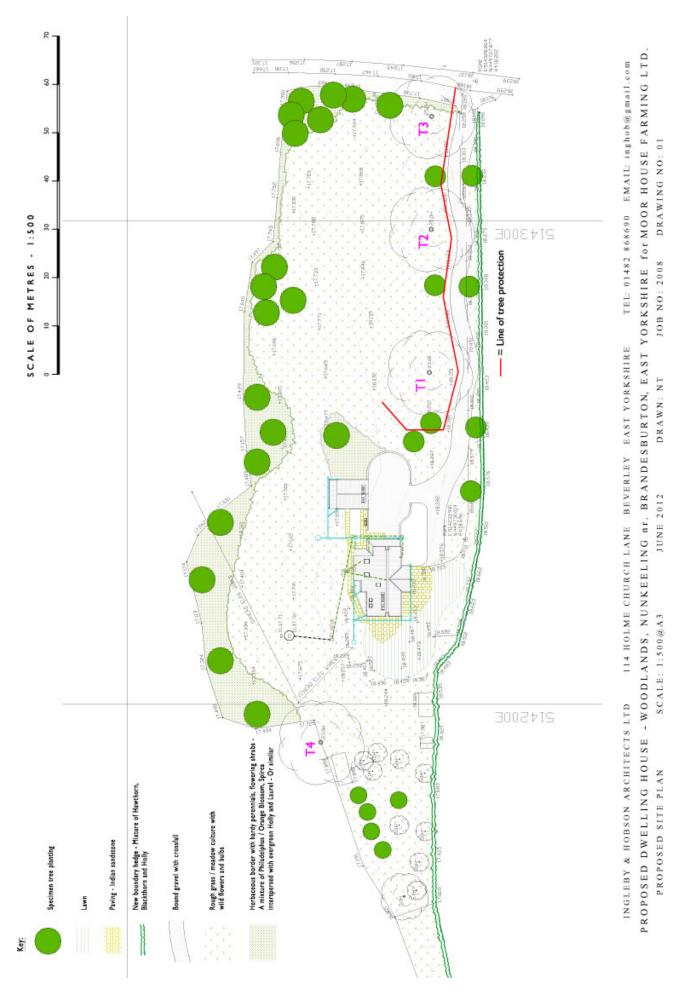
PROPOSED SITE PLAN (not to scale - plan supplied by Ingleby & Hobson Architects Ltd)
